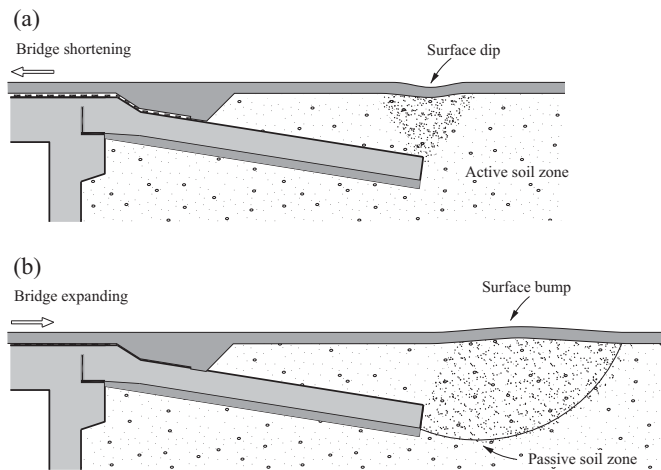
Potential deformations of pavement: a) dip due to bridge shortening, b) bump due to bridge expansion
